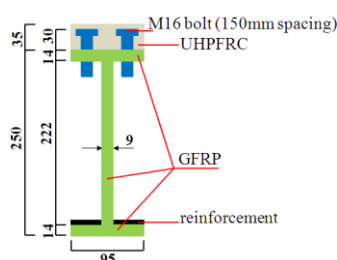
Dimensions of GFRP I-beam (unit: mm)
